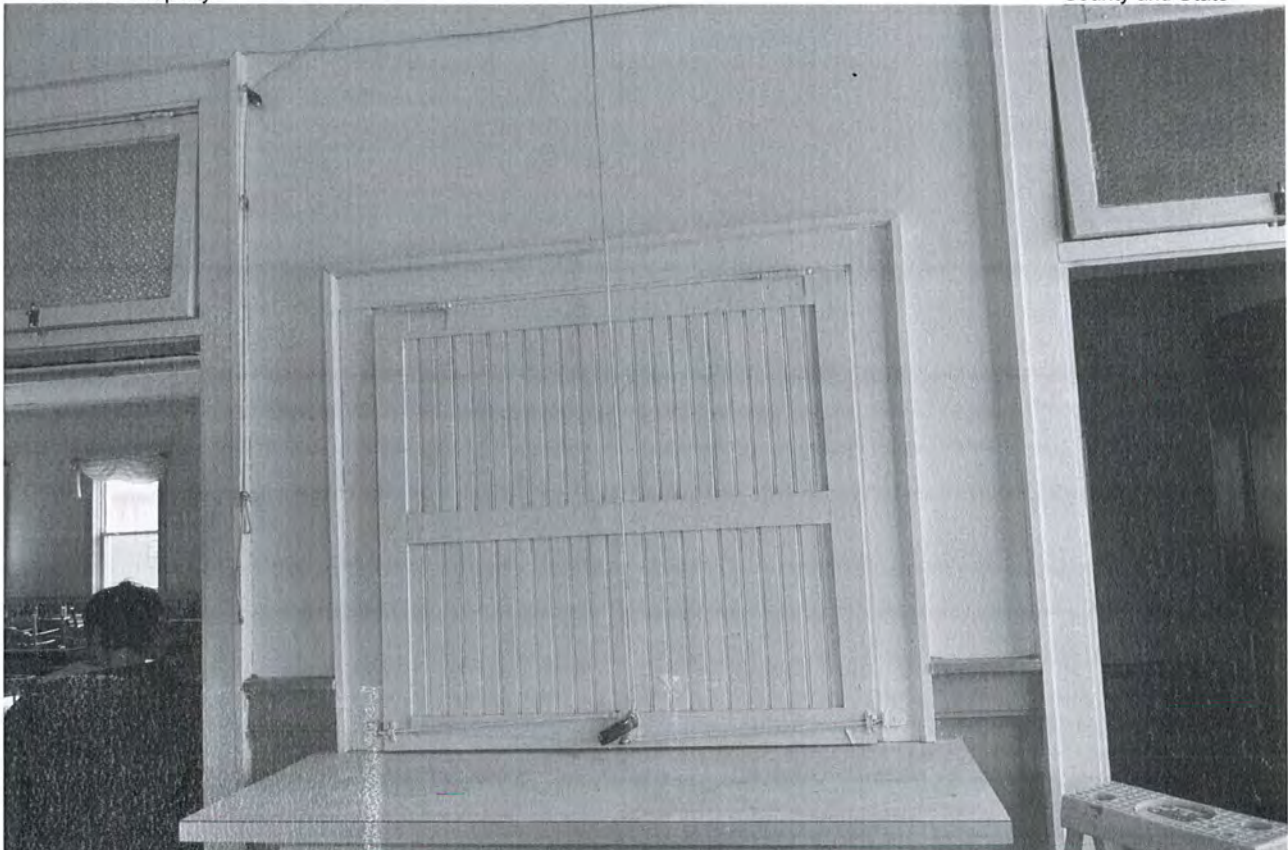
Extant serving window and wainscoting from second story kitchen in American Legion Hall. Transom windows are located above doors throughout the building. (photo Perry)
